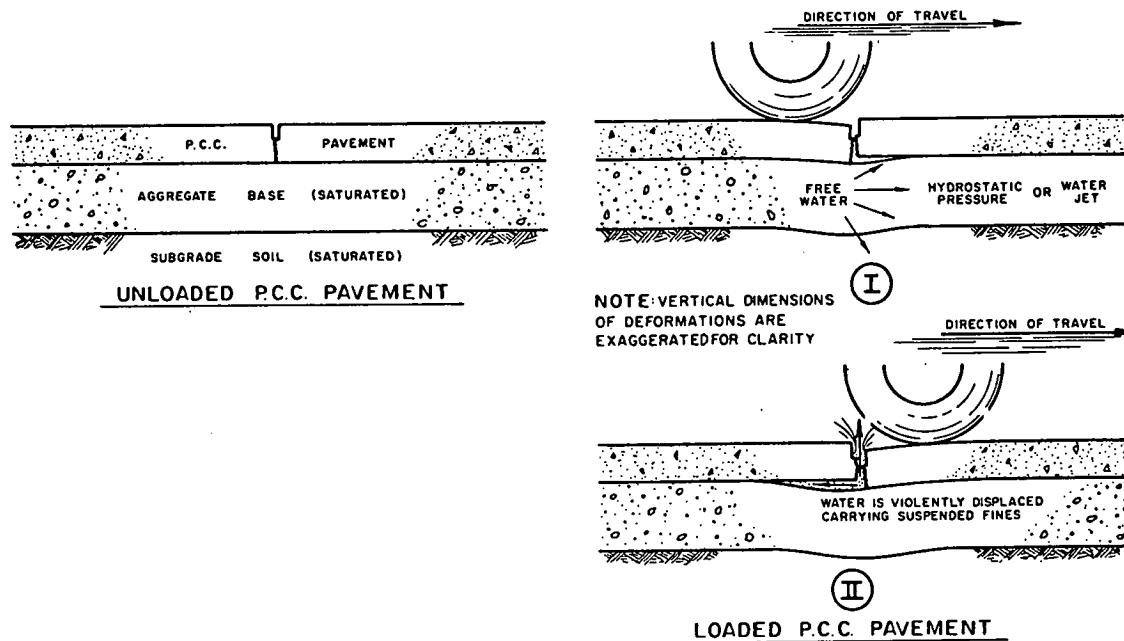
Pumping phenomena under portland cement concrete pavements (10).
